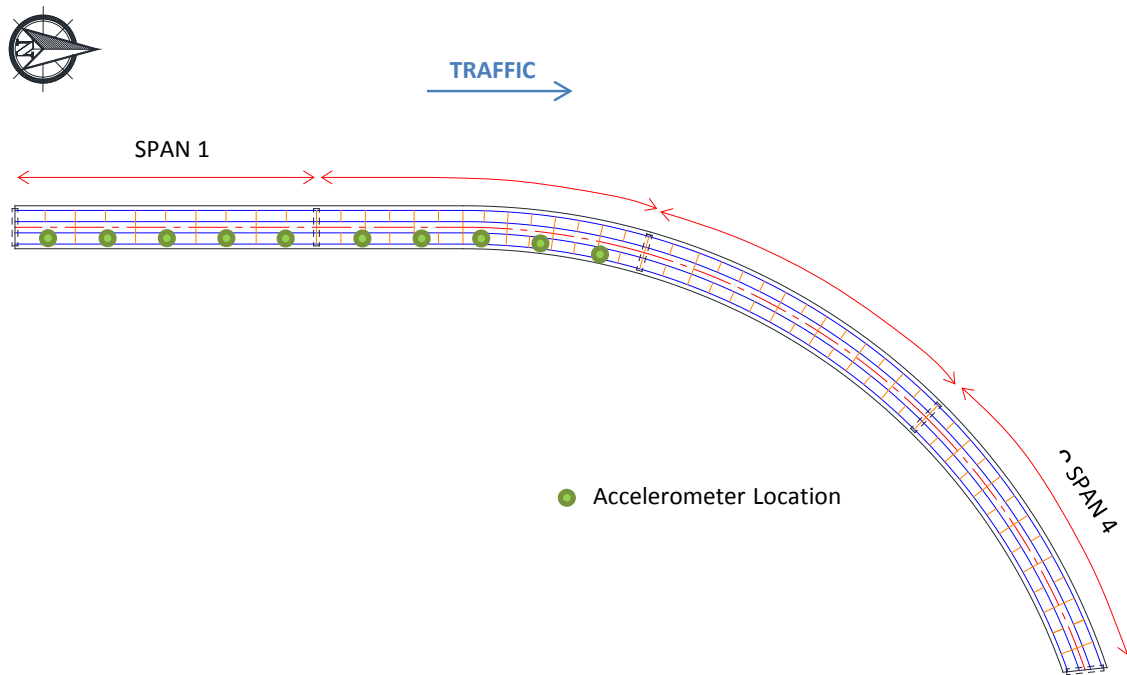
Plan view of the US-290 Bridge showing accelerometer locations.
